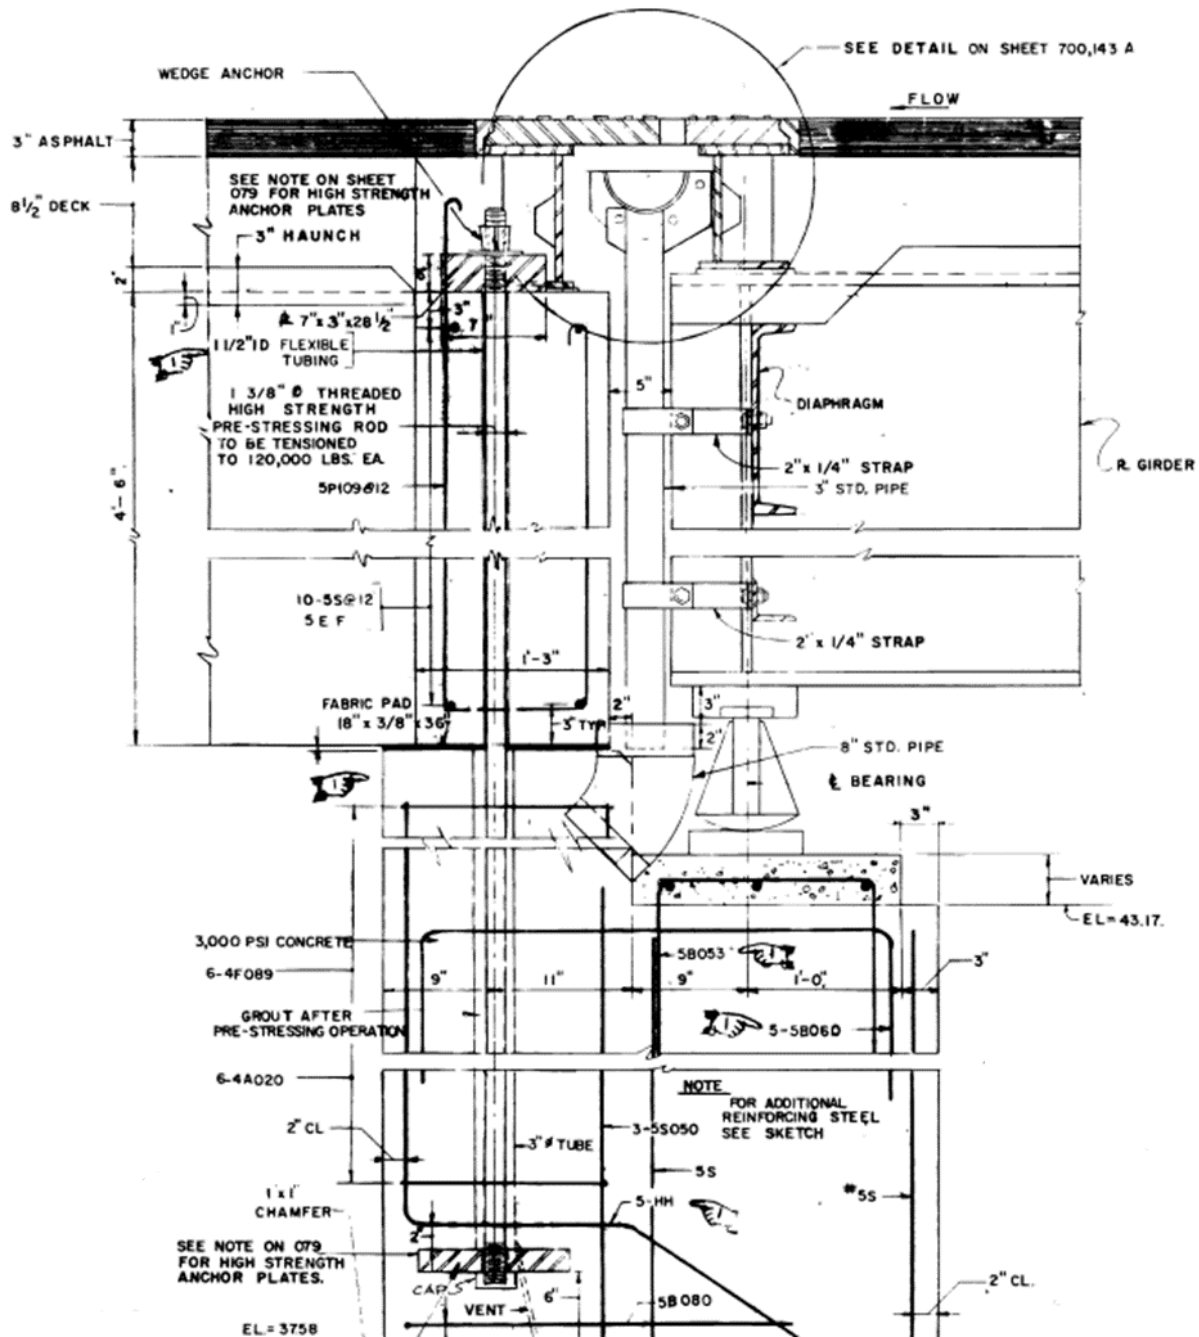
Section depicting steel and concrete beam bearing and PT anchor plates and tie-down rod details for Pier 6 (Sheet 143, Detail Sheet 8 of original plans, 1967).
